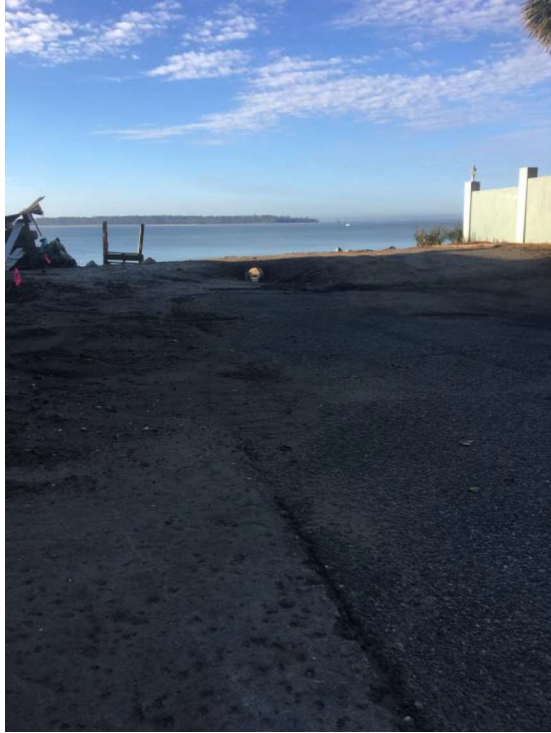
Existing outfall at south end of Georgia St, St. Simons facing southwest.
